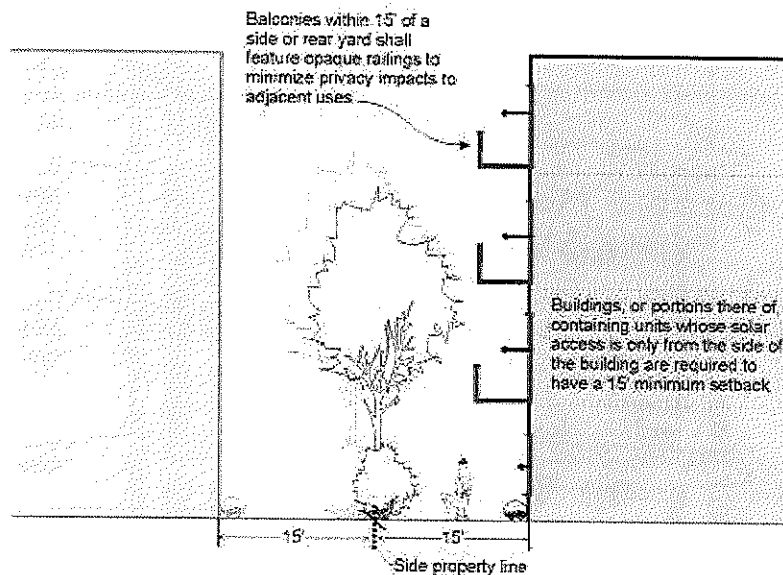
Solar access and privacy standards for multifamily residential buildings along side/rear yards.
